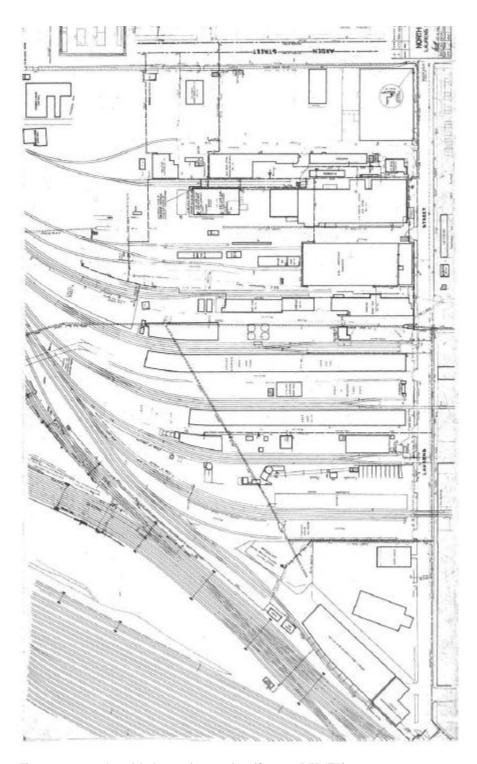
1970 plan of Arden station precinct (Source: DEDJTR)
